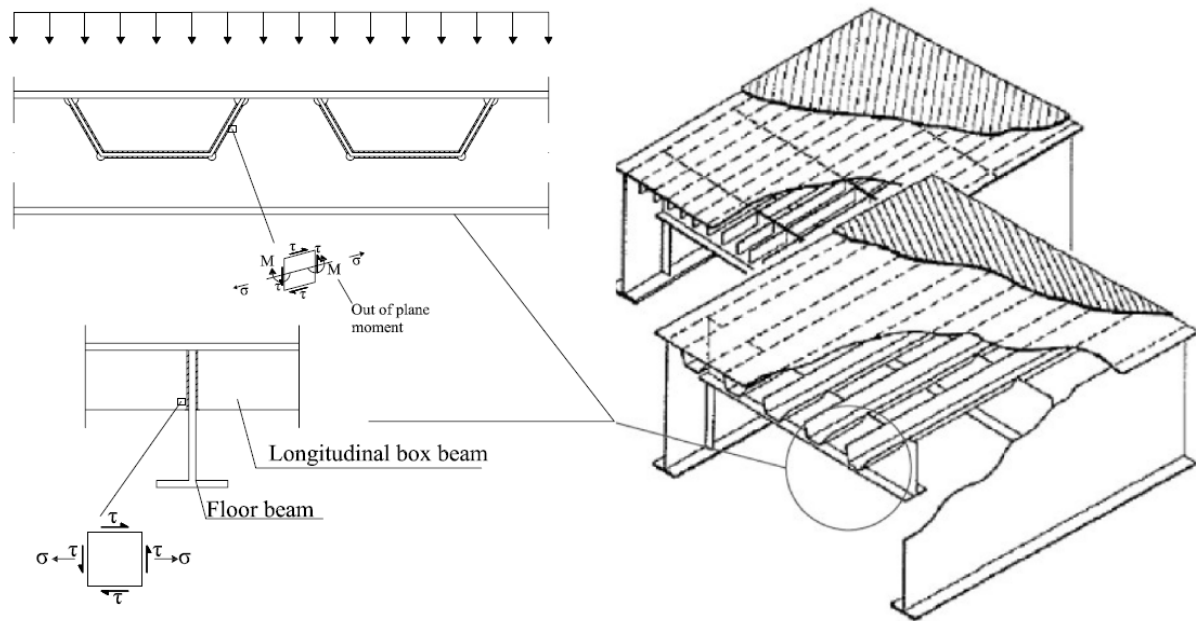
In a orthotropic plate in a bridge deck can some multiaxial stresses in the secondary box beams arise.
